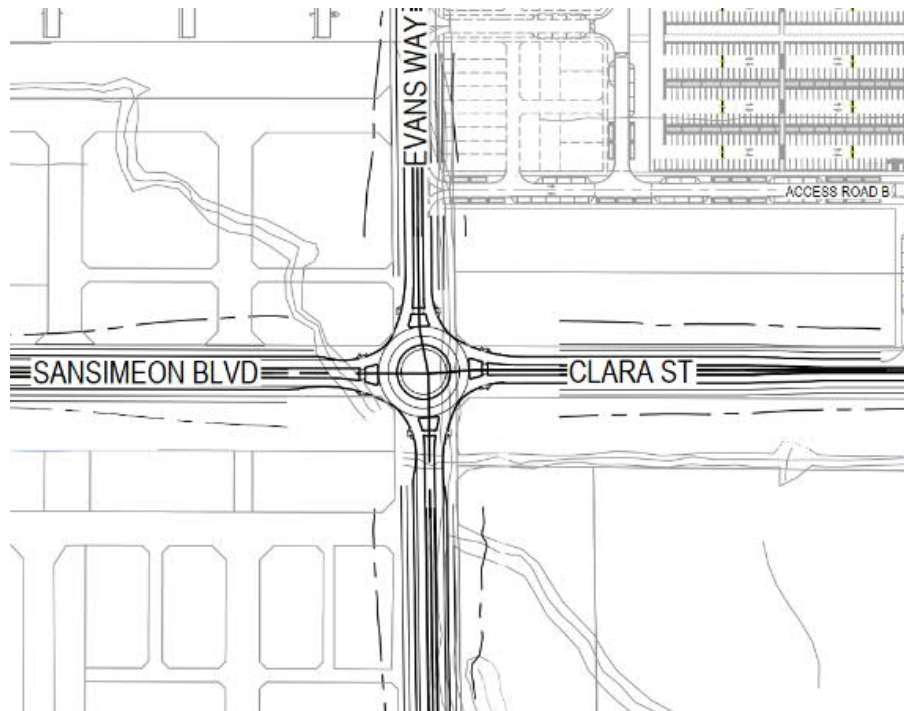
Sansimeon Blvd/Evans Way/Clara St Intersection
